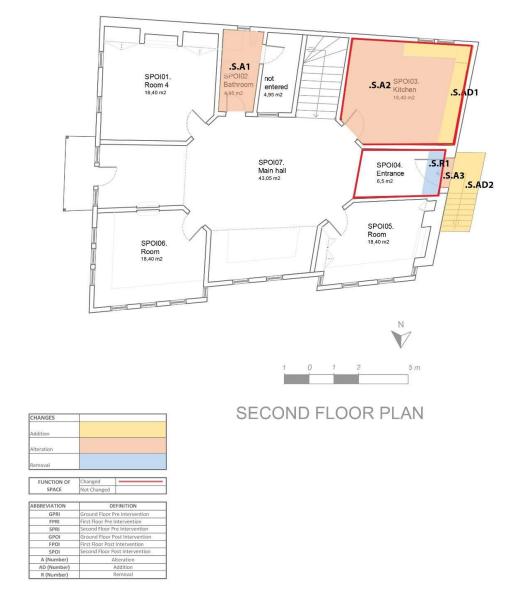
Post-intervention second floor plan indicates the changes during the hotel transformation (Author, 2023)
